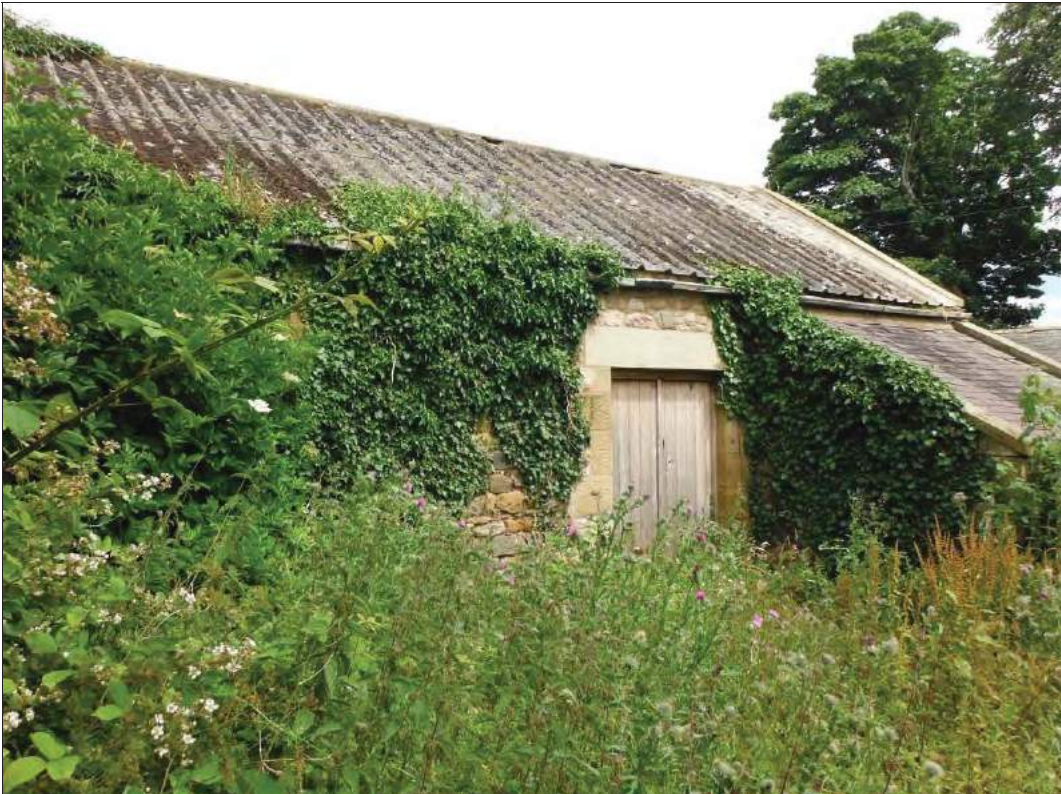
South elevation of the cowhouse forming the northern wing of the farm buildings range, looking north-east.
